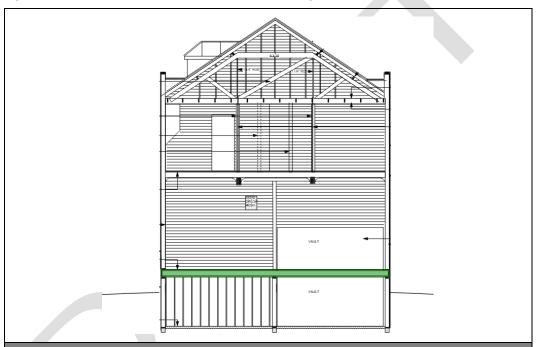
Insulated floor assembly at ground floor, insulation is installed between the floor joists and a ceiling finish at the basement. Below grade walls would remain uninsulated with this approach. Placement of the plane of the insulation is shaded green (drawing underlay source: Keay Architecture Ltd.).
